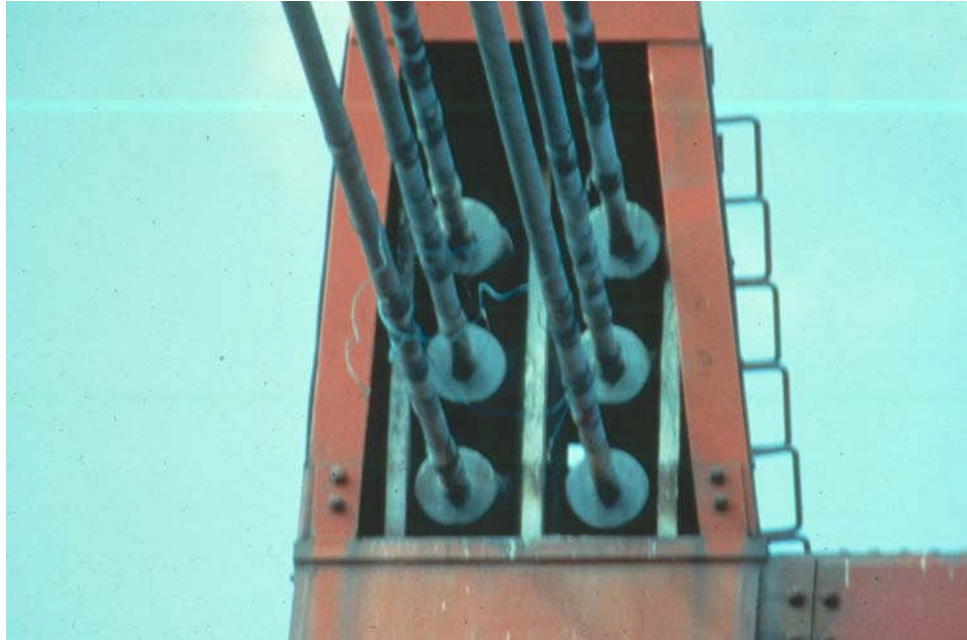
Neoprene Boot at Steel Anchor Pipe Near Anchor
